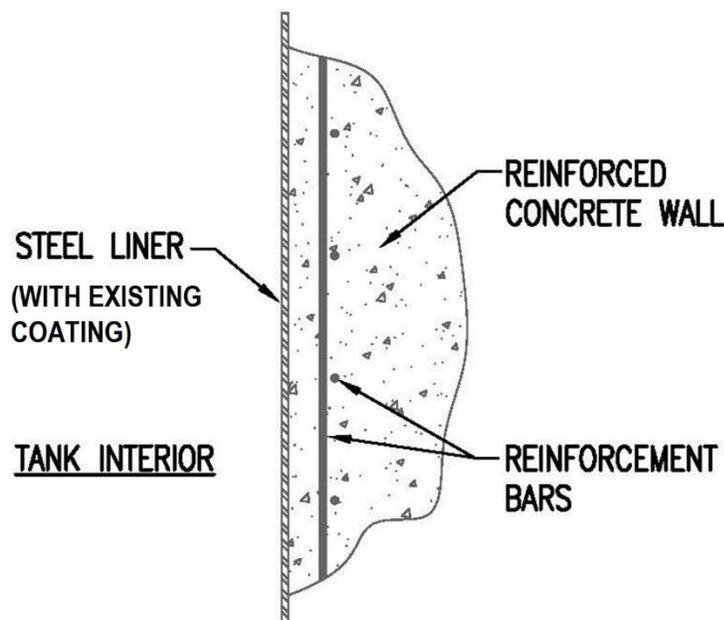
Tank Upgrade Alternative 1A - Typical Wall Section
